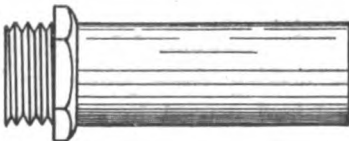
Combination Lead and Brass Soldering Nipple Threaded for Wrought Pipe.
